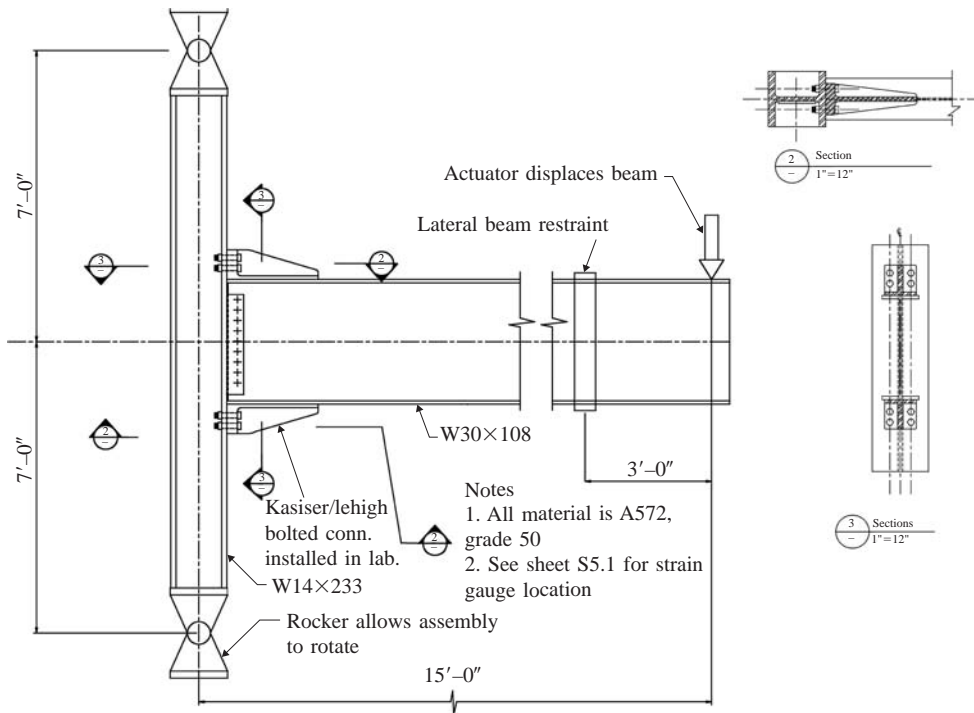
Test subassembly elevation for BB connection specimen HH-8.
